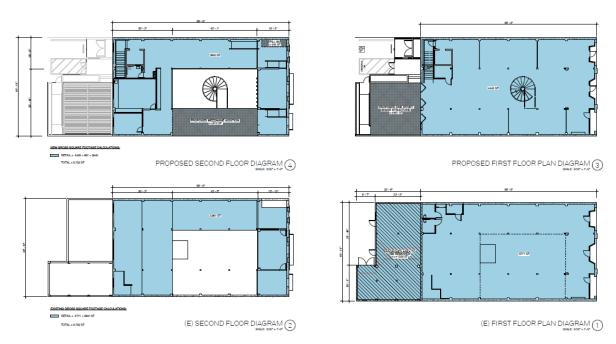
Existing (bottom) and proposed (top) floor plan diagrams. Source: Standard, "Blu Dot Palo Alto" (November 2, 2021), Sheet A005.
